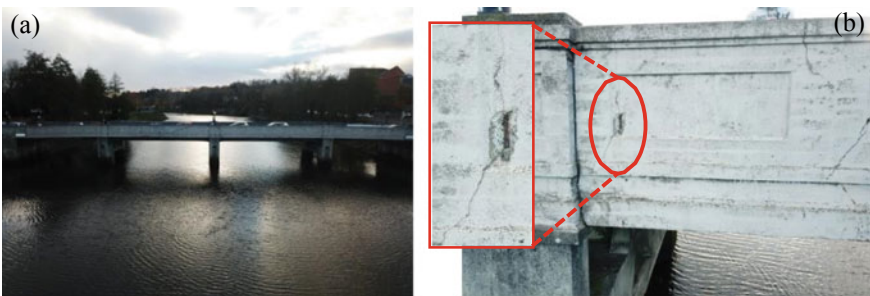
a King’s bridge located in Belfast, Northern Ireland, b Closer detection of cracks using the multi-rotor Mavic Pro
